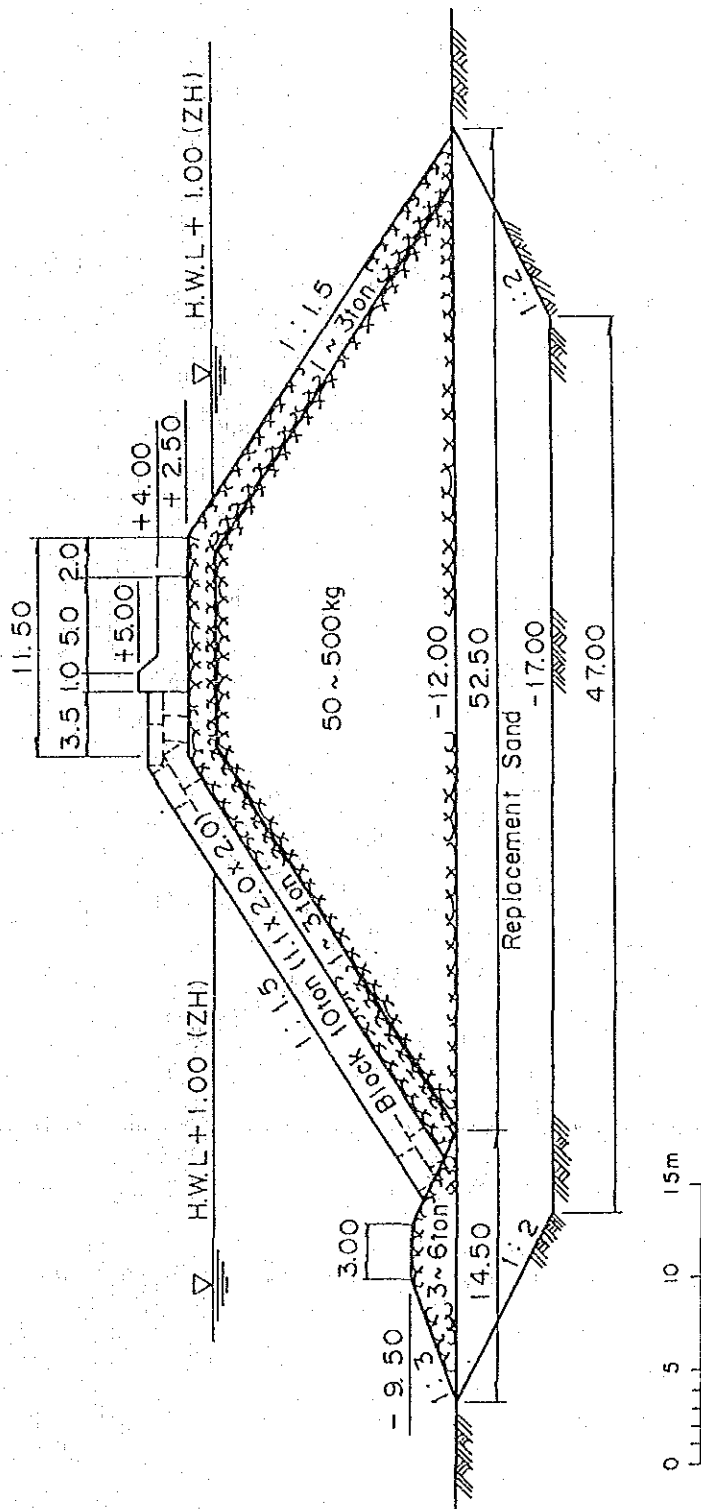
Typical Cross Section of West Sub Breakwater
